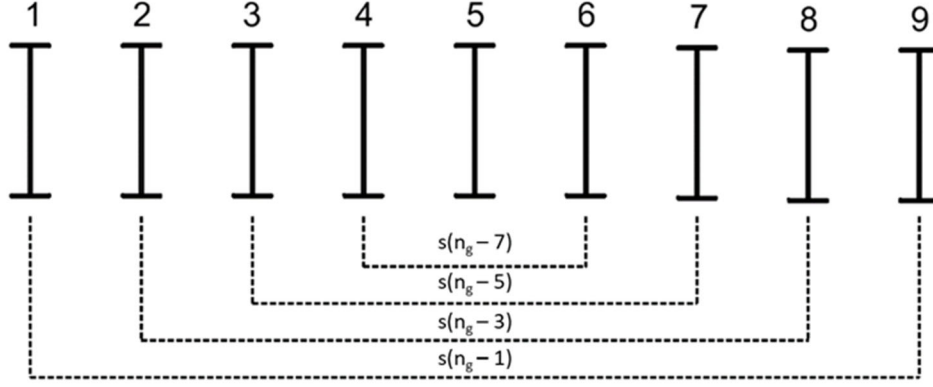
Example Girder Pairs for an Odd Number of Girders (Fish, 2021)
